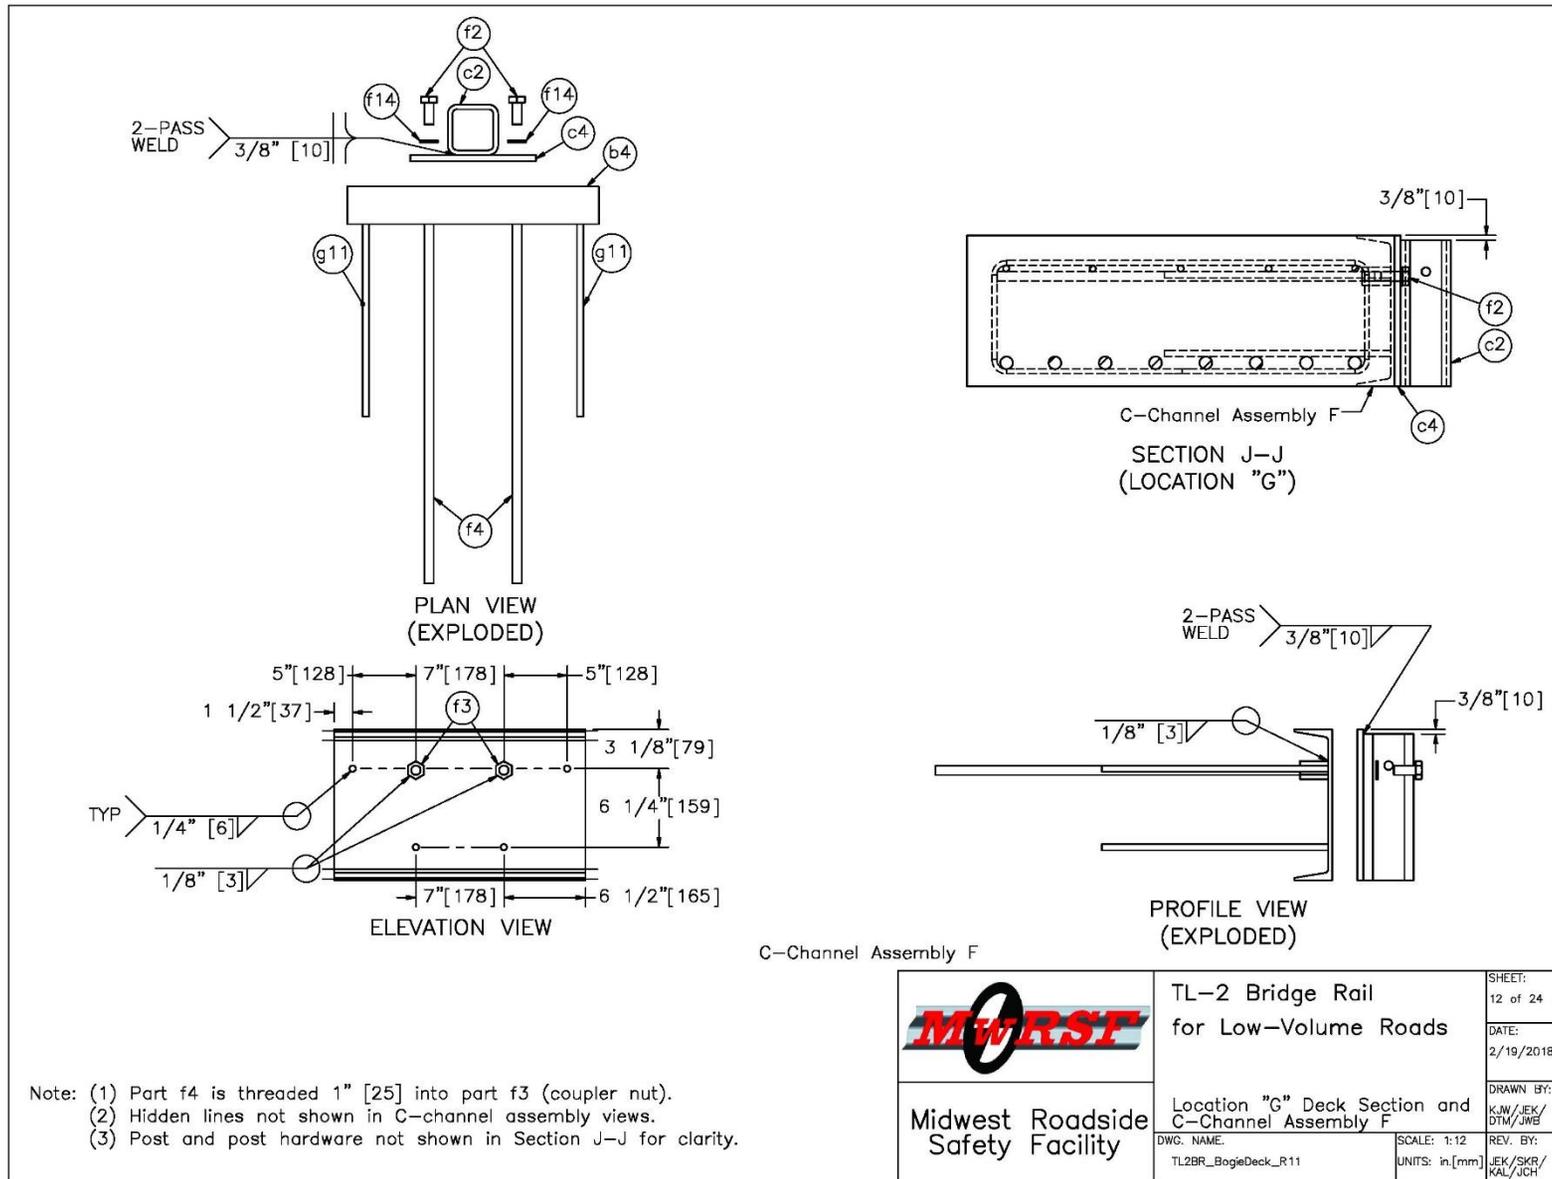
Bogie Testing Matrix and Setup, Location "G" Deck Section and C-Channel Assembly F
